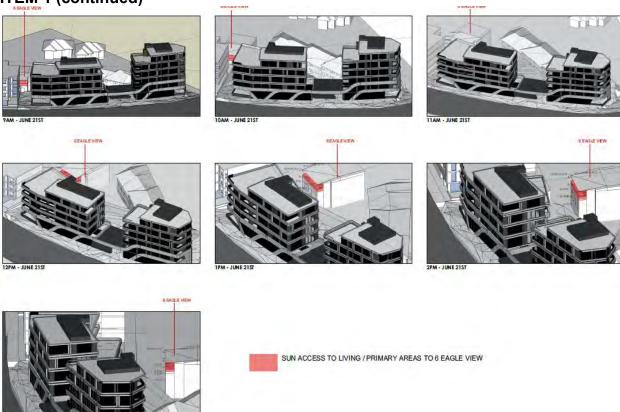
View from the sun diagram showing overshadowing to No. 2-4 and 6 Eagle Street
